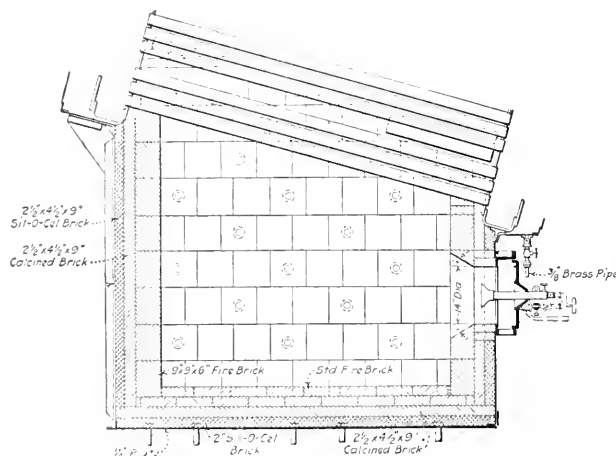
ARRANGEMENT OF FURNACE OF BOILER FOR OIL FIRING
